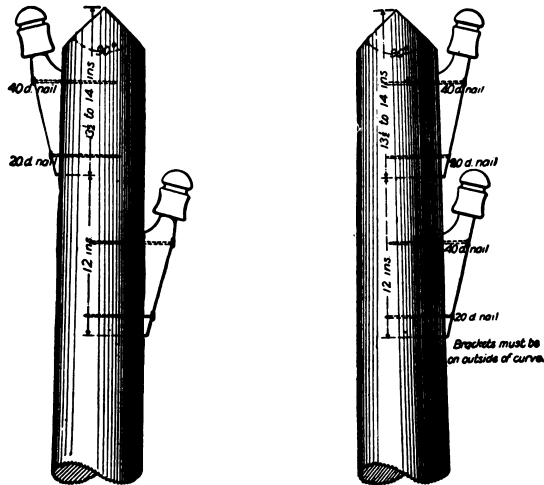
AERIAL LINE CONSTRUCTION, ATTACHING BRACKETS.
